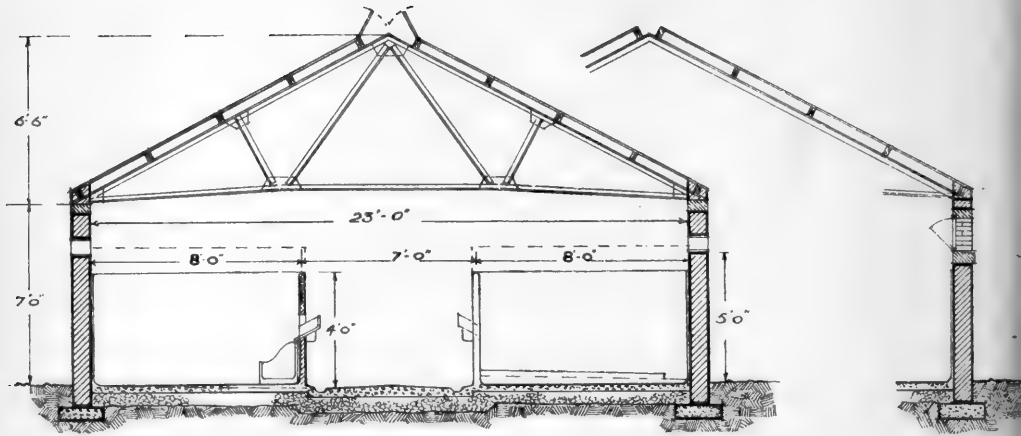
Section of a piggery. The dotted lines above the pen partitions indicate the height to which the partitions should be built for a boar's pen. An alternative method of providing outlet for the foul air is by a permanently open ridge as shown in the adjoining figure, in which case the Sherringham windows are used instead of fireclay pipes for the air inlet.
